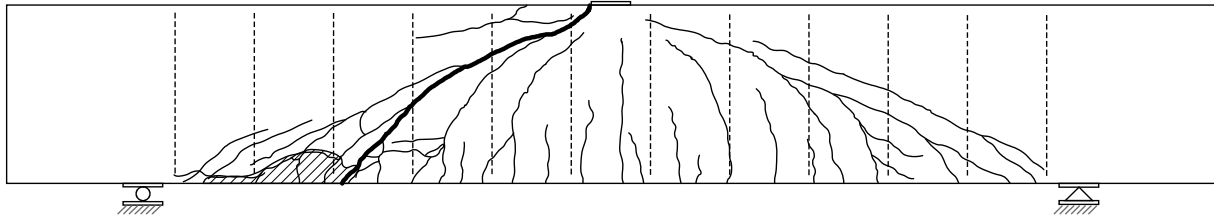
Damage to specimen P1S1 with stirrups (S detail) ($f_{ym} = 69.8$ ksi [482 MPa], $h = 36$ in. [910 mm])
